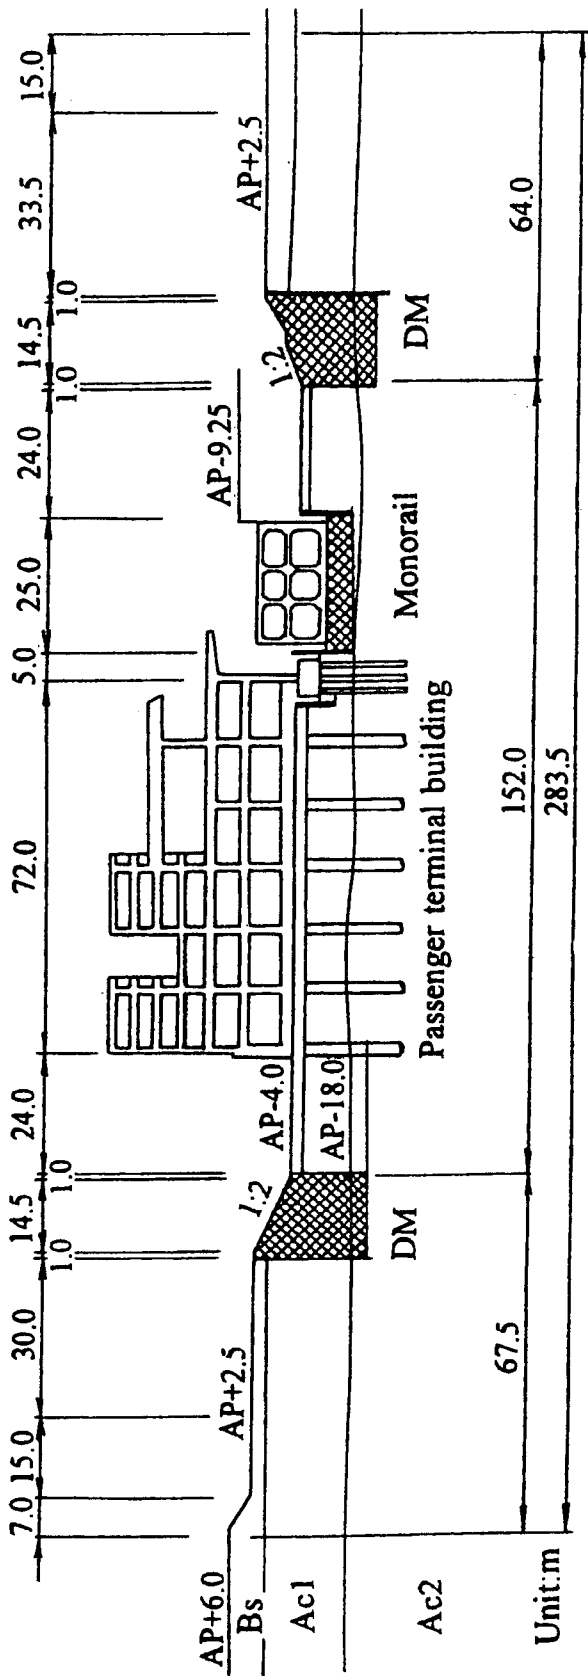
Typical cross section of excavation work (Shiomi et al., 1996).
